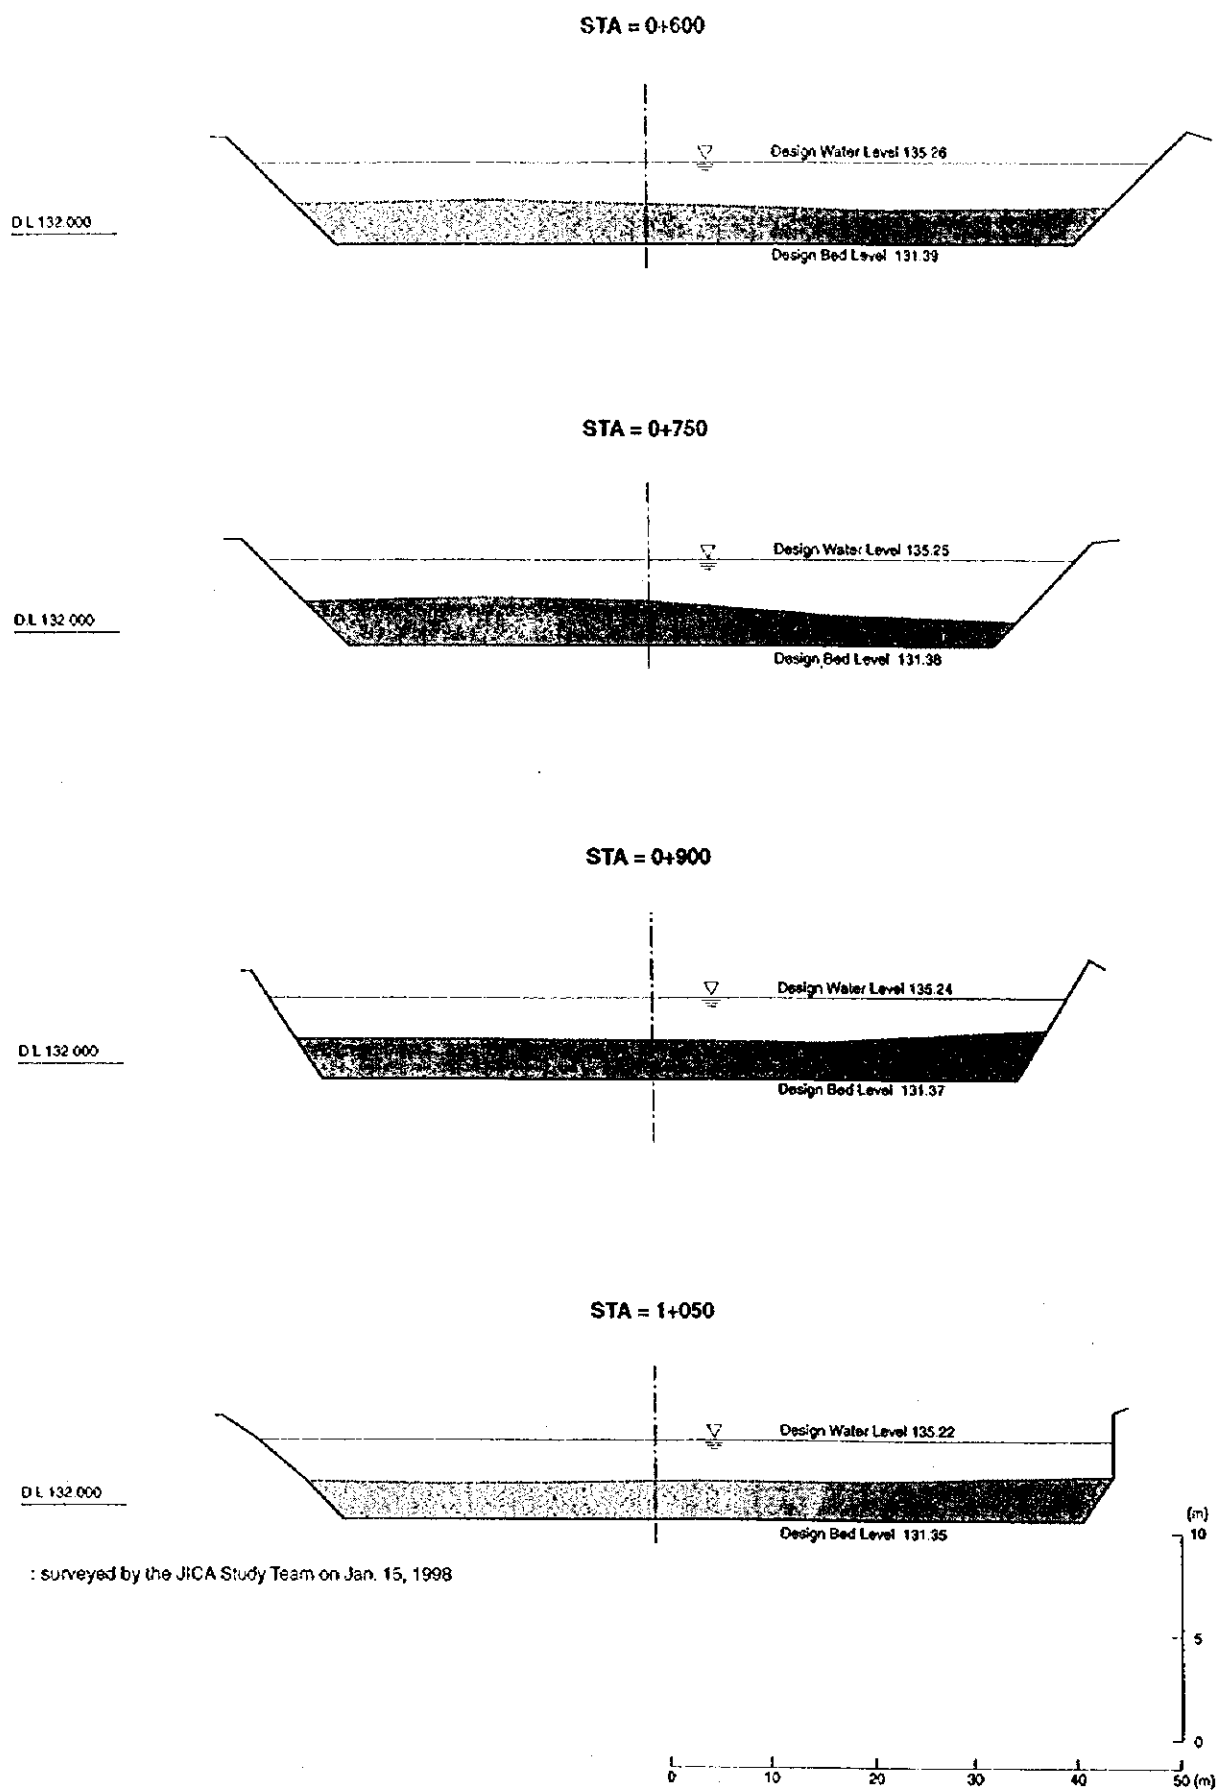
Cross Section of D.G. Khan Canal at Taunsa Barrage (2/4)
